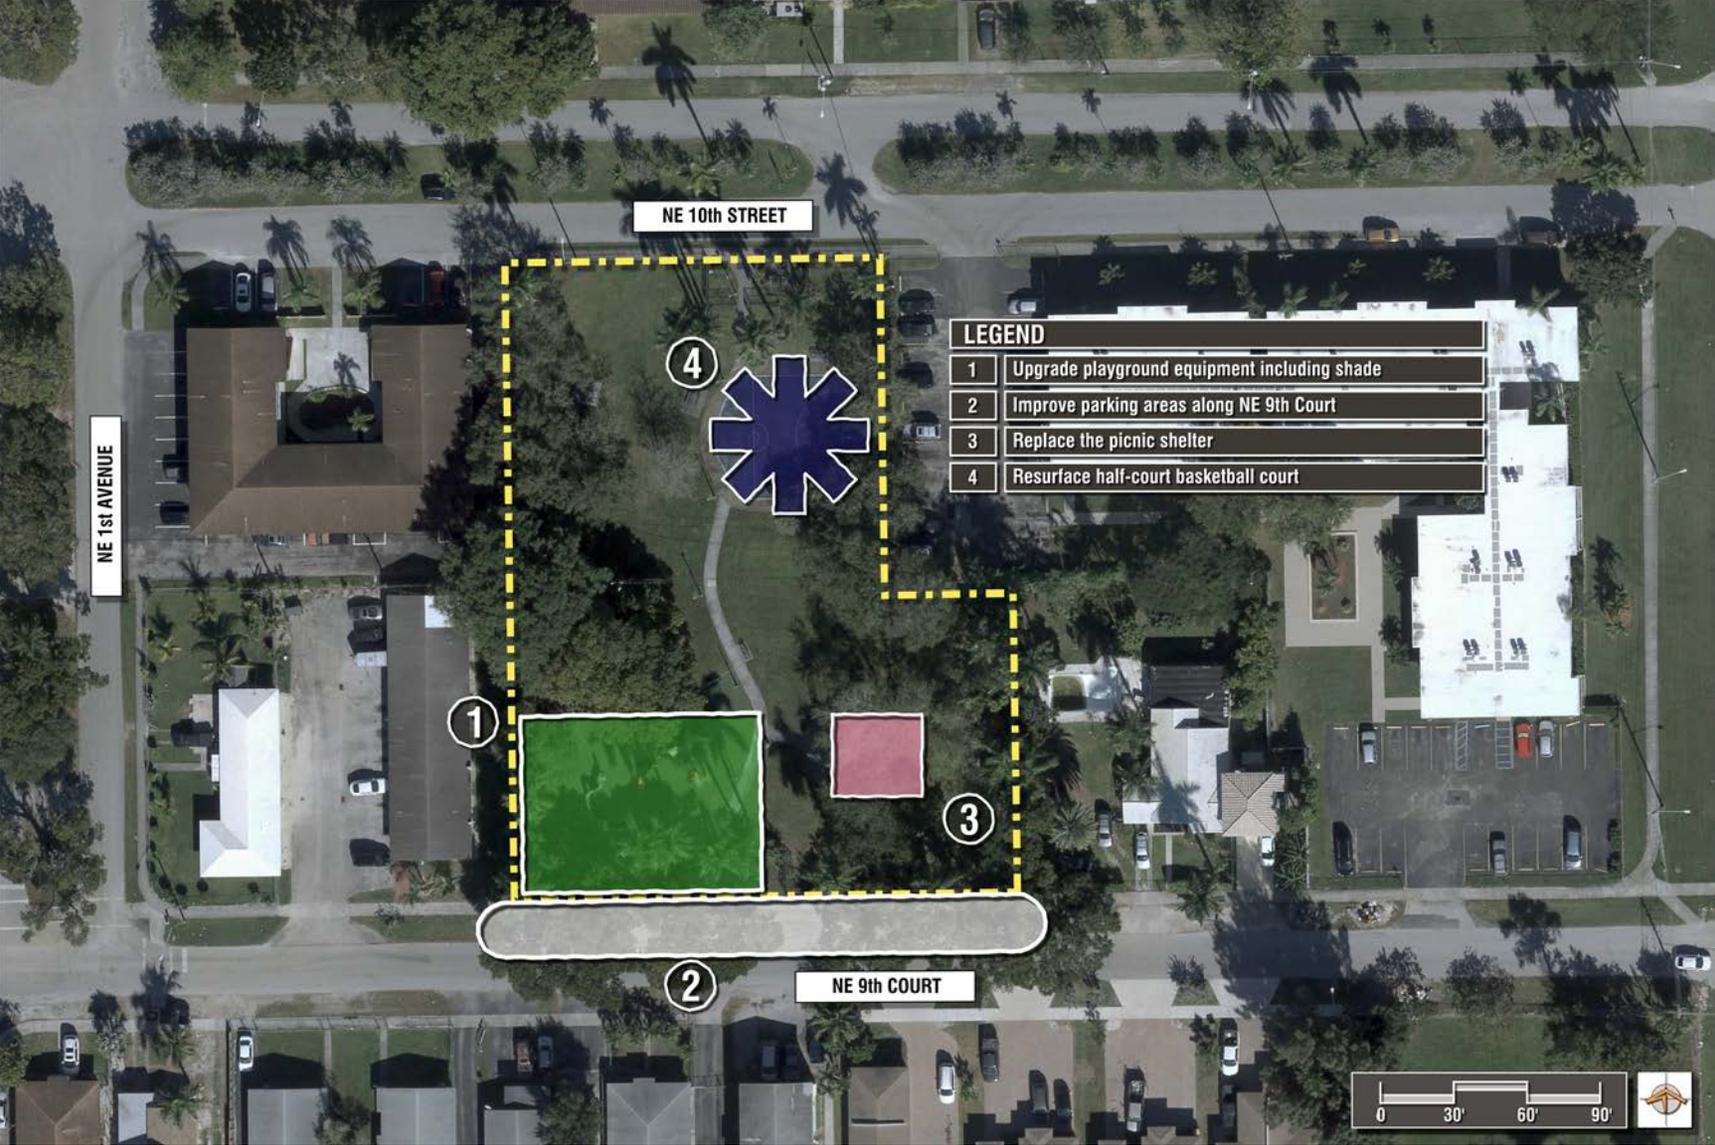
PROPOSED IMPROVEMENTS TO ANGELA MISTRETTA PARK (DIAGRAM)
